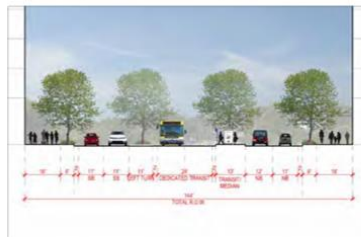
Cross section showing improvements to Van Dorn Street - "A" street
